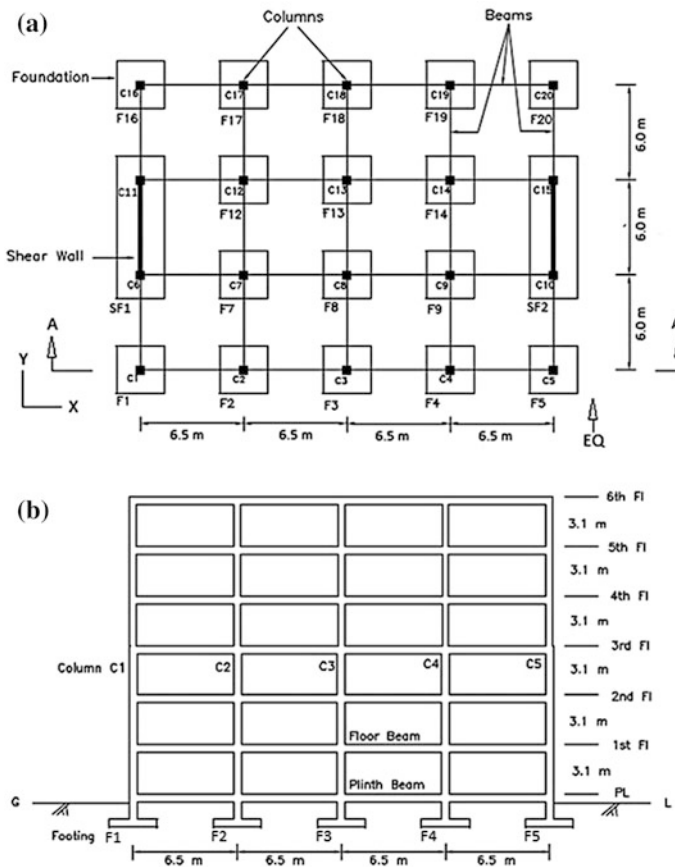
a Plan of the Multi-Storeyed Space Frame with shear wall. b Sectional Elevation at section A-A
